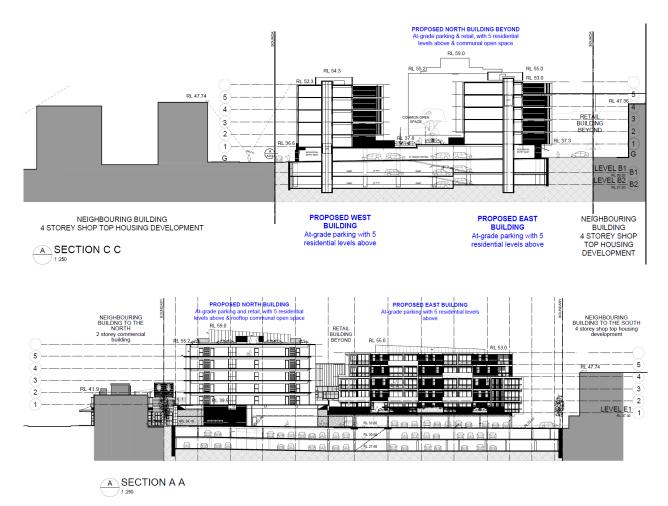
Section plans A-A and C-C taken through the site showing the existing surrounding development relative to the proposed concept plan development comprising at-grade and basement parking and apartments above.
